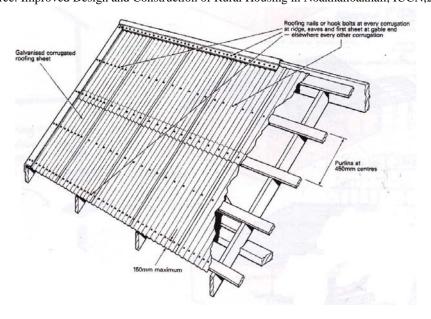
Techniques of fixing CI sheet roof CladdingSource: Improved Design and Construction of Rural Housing in Noakhalioakhali, IUCN,2008
